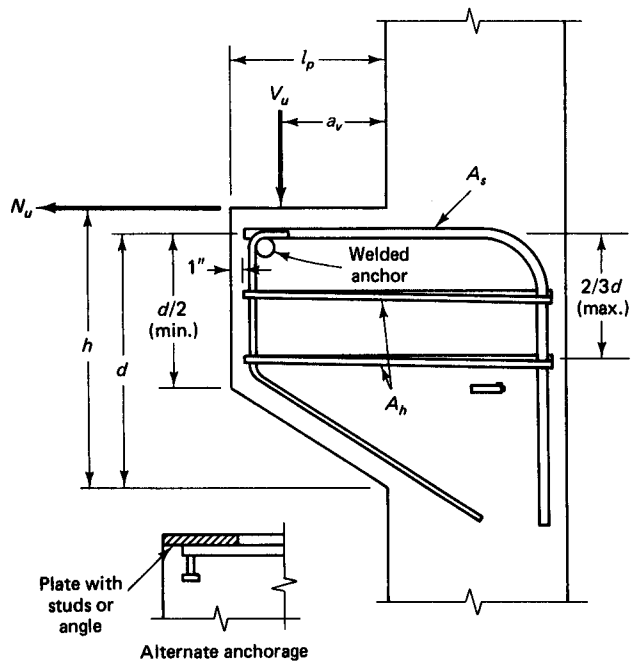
Typical corbel reinforcing details (see also Example 5.7.).
